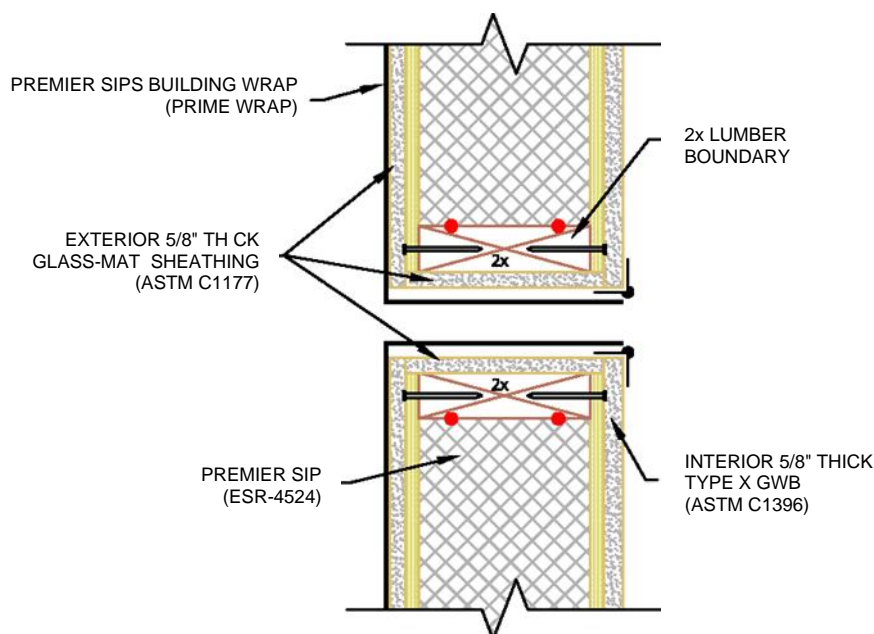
TYPICAL DETAIL FOR WINDOW OPENING PROTECTION (NOT TO SCALE)
